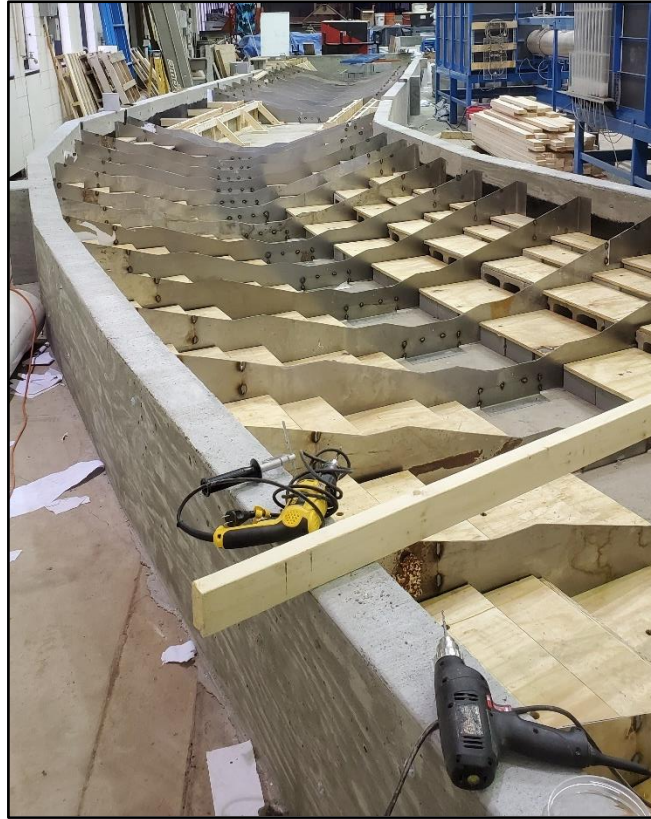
Sections filled with cinderblocks and sheathing covers.
